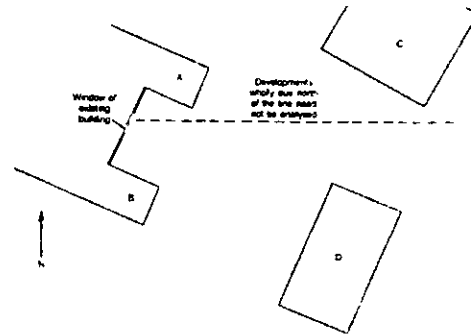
In analysing the sunlighting impact on the existing window, no check need be made for proposed extension A and new building C, as they lie within 90° of due north of the window. Proposed extension B should be checked, as should new building D if it subtends more than 25° to the horizontal, measured in section from the centre of the window
